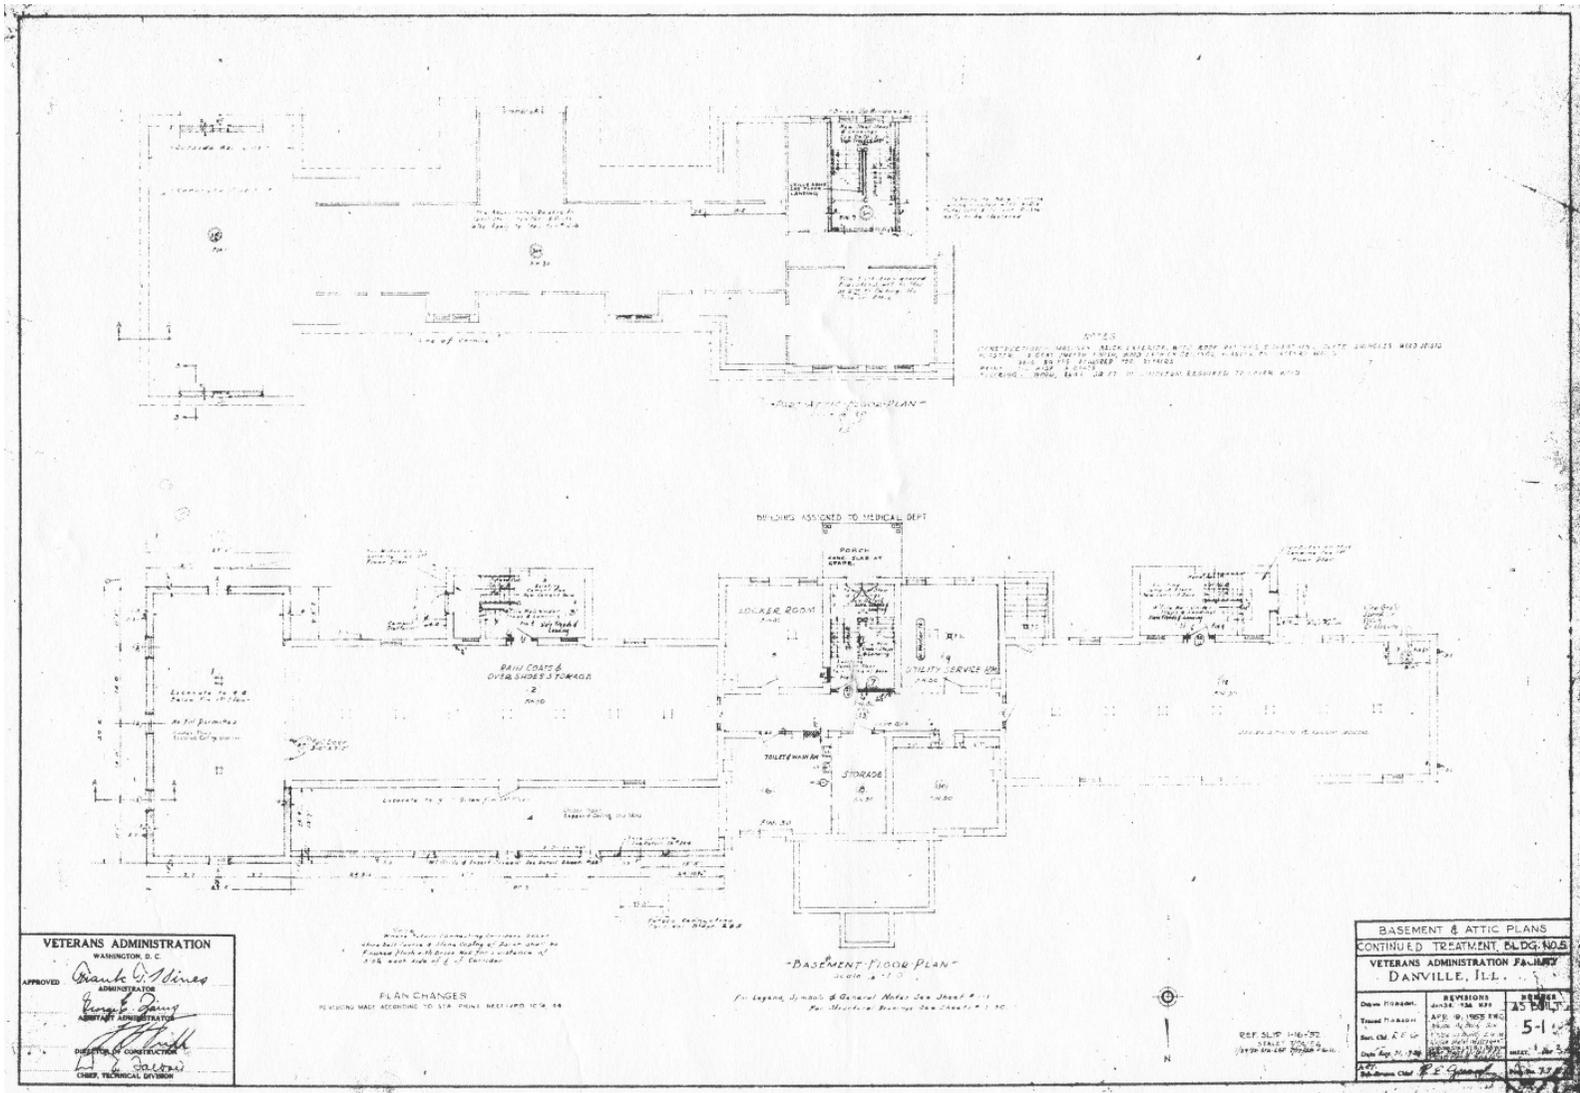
Basement and partial attic plans for Building 5, showing modifications undertaken by the VA in 1934 and later.
